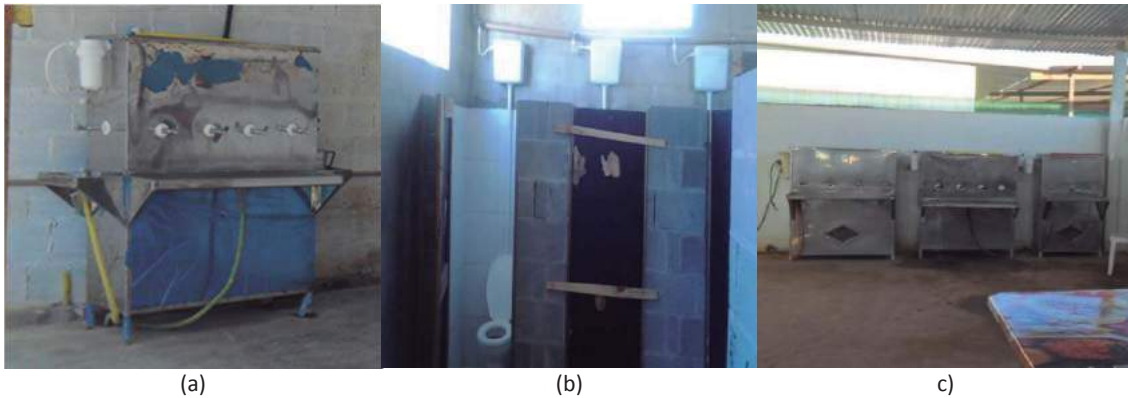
Sustainable Construction Practices . (a) Water supply for consumption- Site A (b) high level flushing tank - Site B (c) Supply of drinking water – Site C
